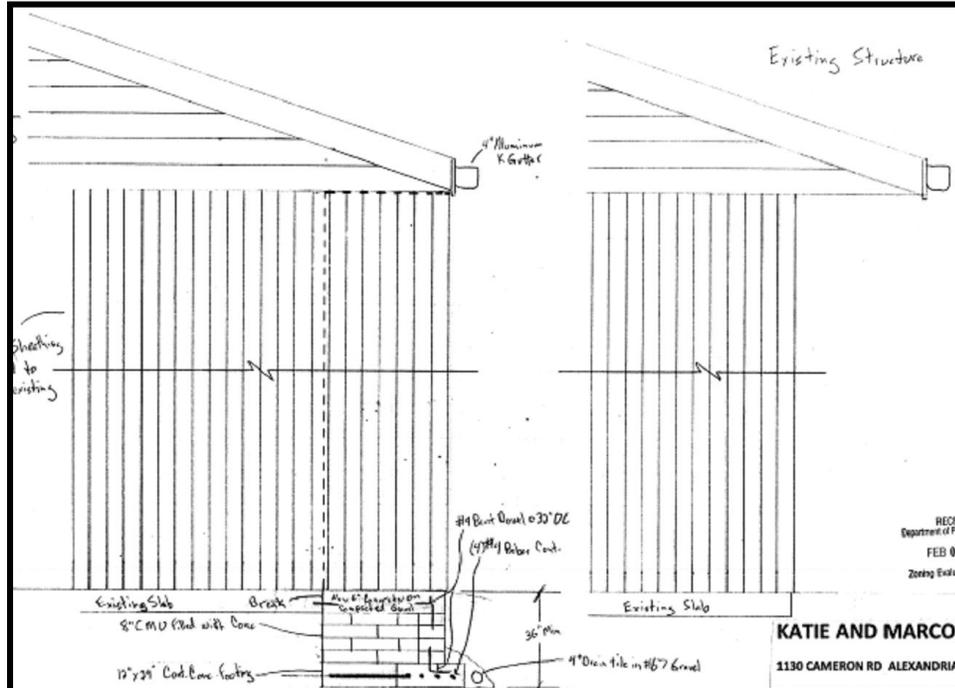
Side-view rendering of proposed addition to front of garage. Source: Applicant.
